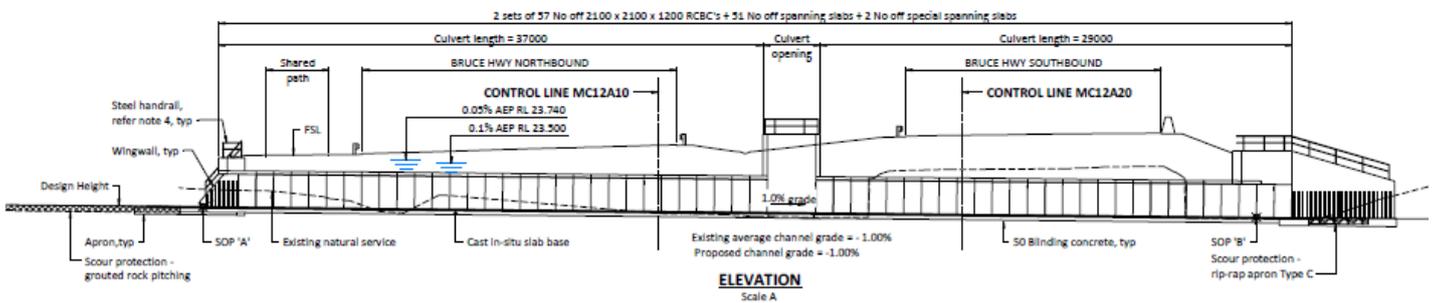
Mackey Ck Culvert Cross Section detailing 0.1%AEP (1:1000 year) and 0.05%AEP (1:2000 years)
